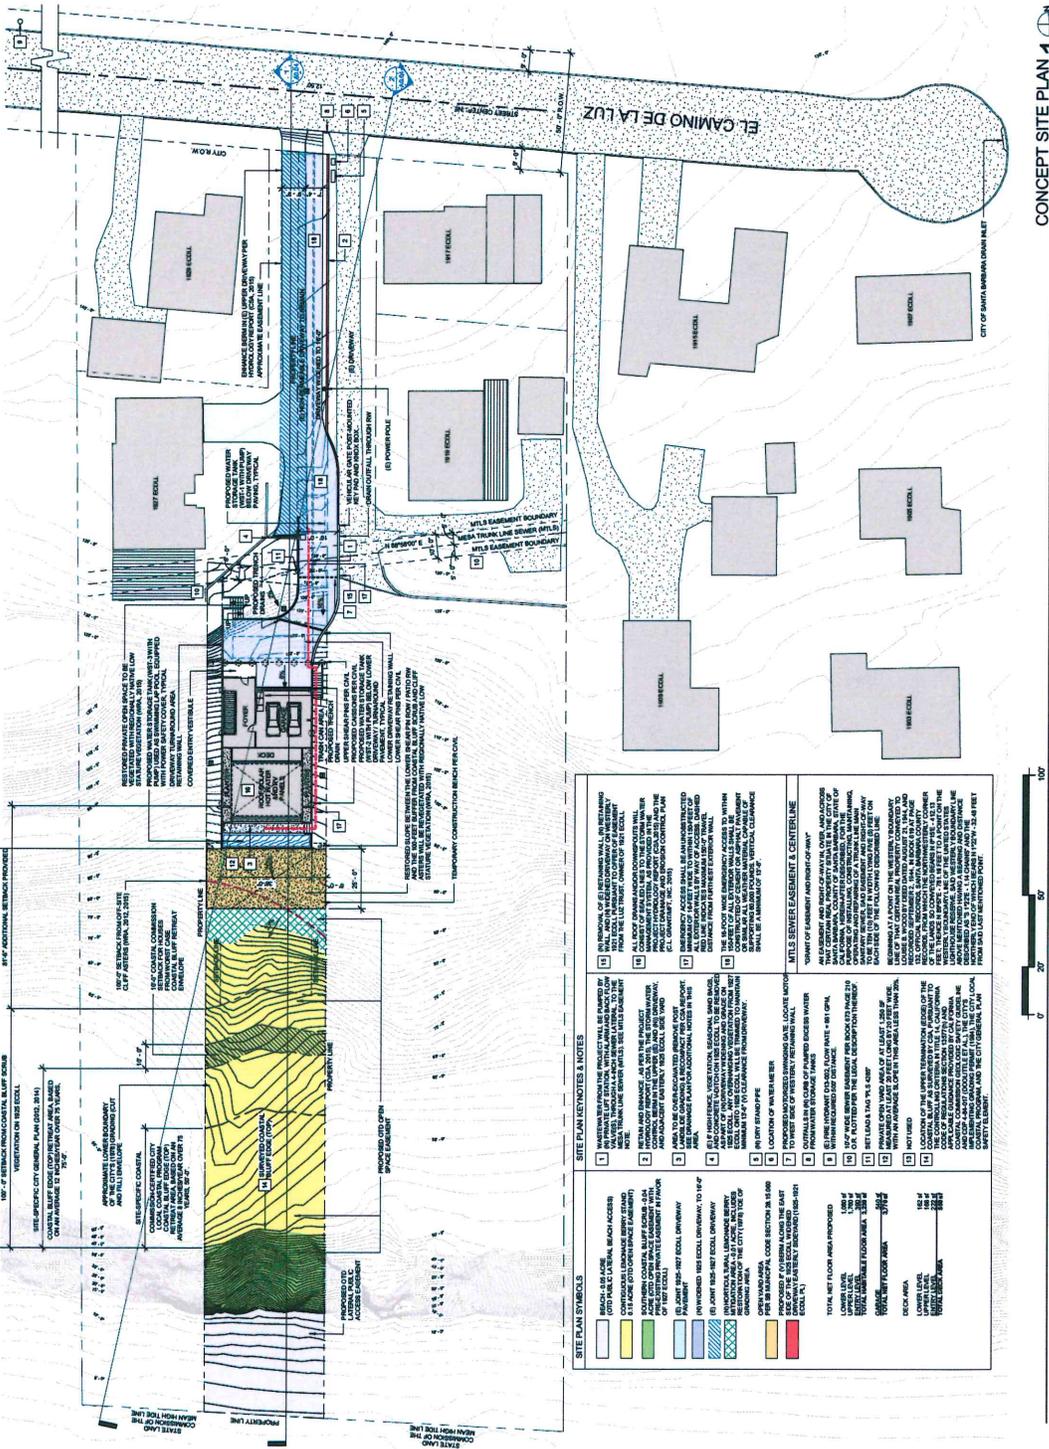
, ABDS SITE PLAN, SEPT. 2015
